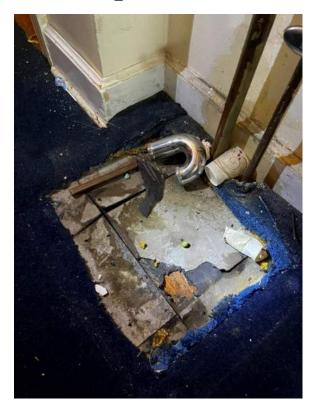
IMG_1241 - Interior 1st Floor West side hallway to West emergency exit – Water fountains have been removed. Evident water damage at area of removal.
